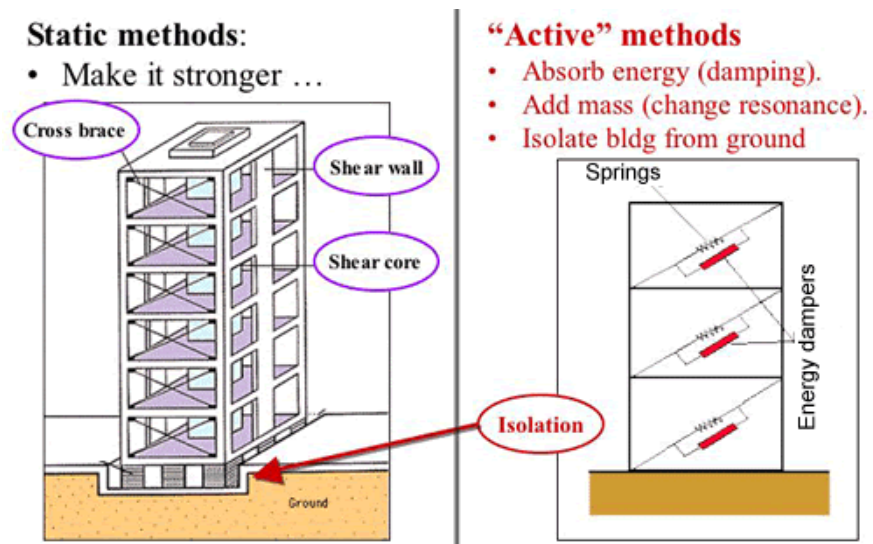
Static and active methods to retrofit buildings to better withstand shaking.
